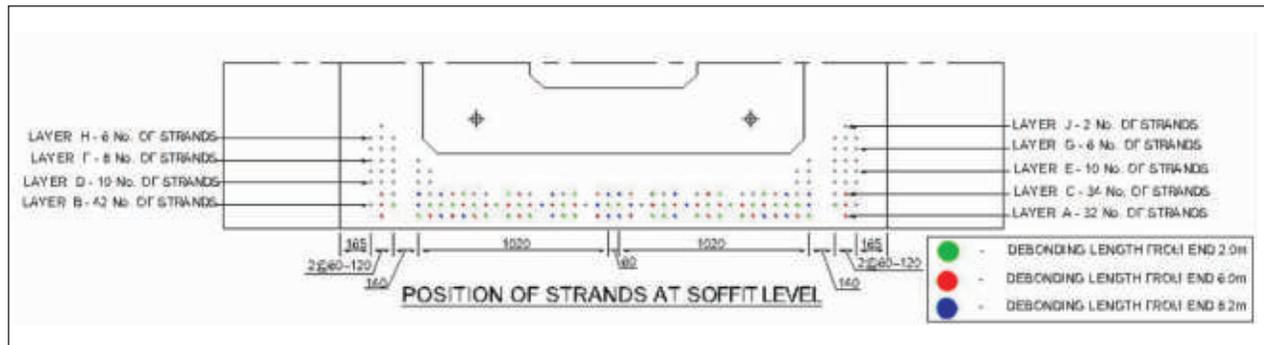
Strand arrangement at soffit level (showing de-bonding arrangement)
